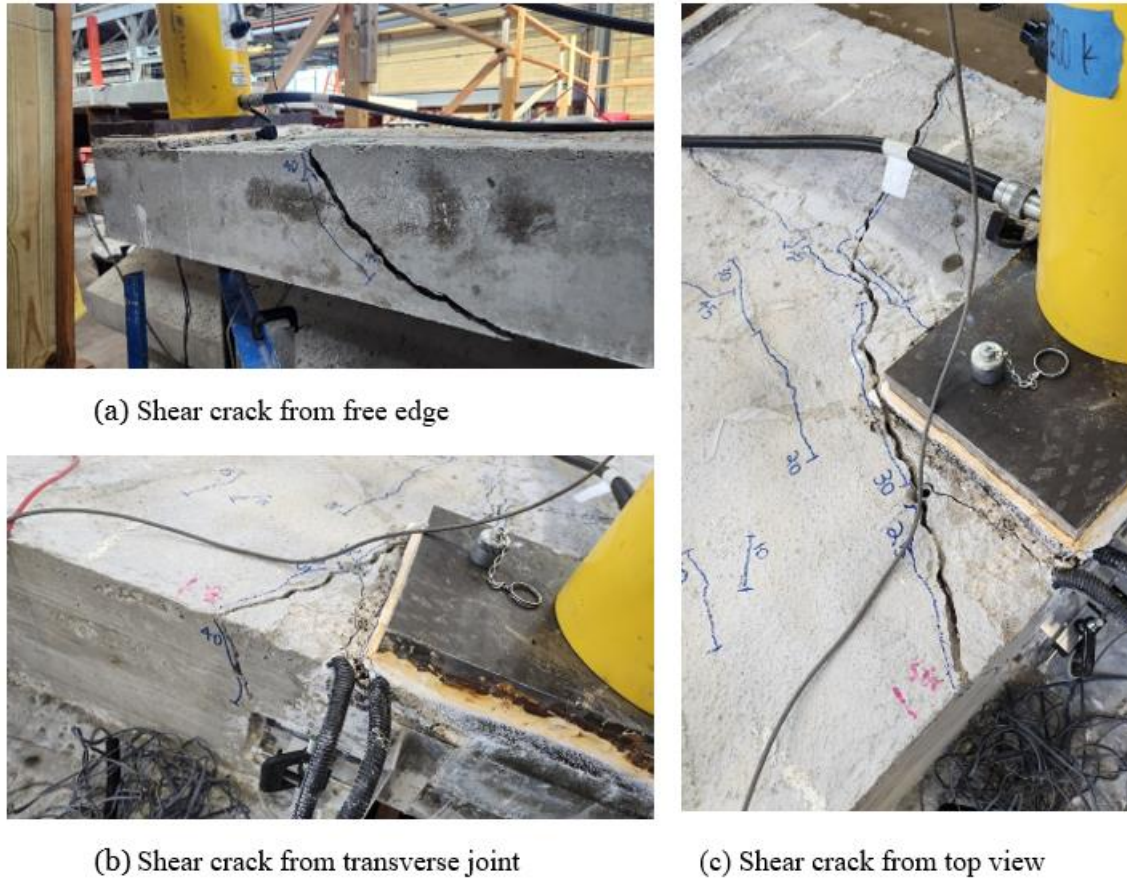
Test 6 – Hand-Welded Panel Pair Short Overhang – Shear Crack at Ultimate Load
